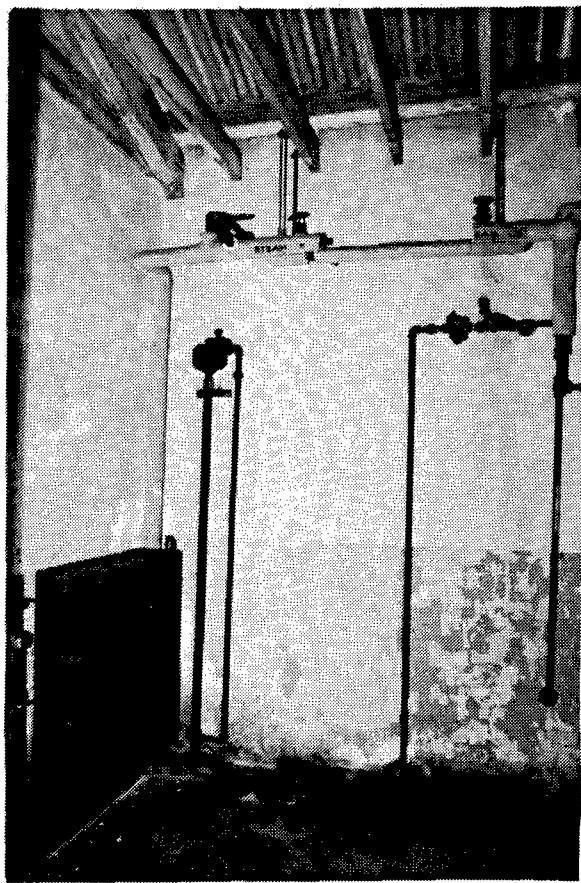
Building 2F-33: Interior view of the Pellet Storage Building.
